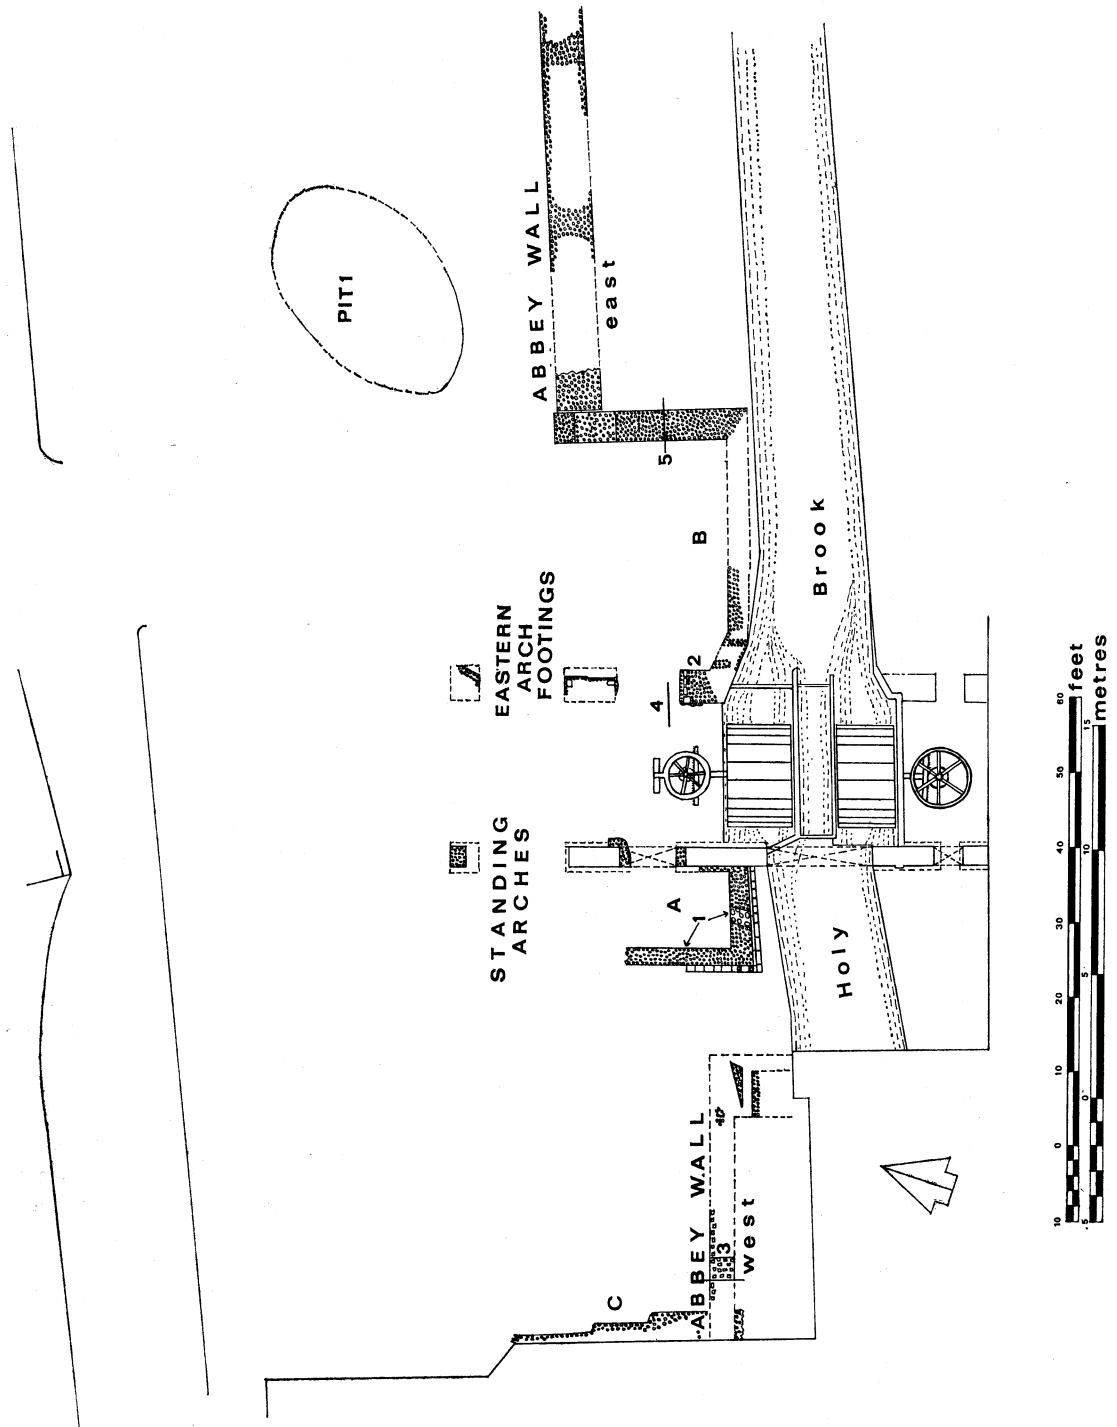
Abbey Mill Site showing medieval remains and modern wheels. The numbers are the Section numbers given in Fig. 3. A : Area to west of Standing Arches. B : Footings east of Footings of Eastern Arches. C : Far West Footings.
